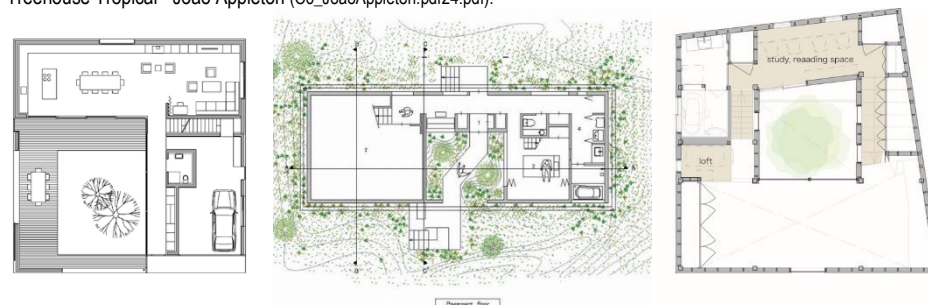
Wooden house with an inner courtyard - Bernardo Bader (<http://europaconcorsi.com/authors/30439-Bernardo-Bader/>); Fig. 325 - Nest / UID Architects (<http://www.archdaily.com/285221/nest-uid-architects/>); Fig. 326 - House J - Keiko Maita architect office (<http://www.archdaily.com/382445/house-j-keiko-maita-architect>).
